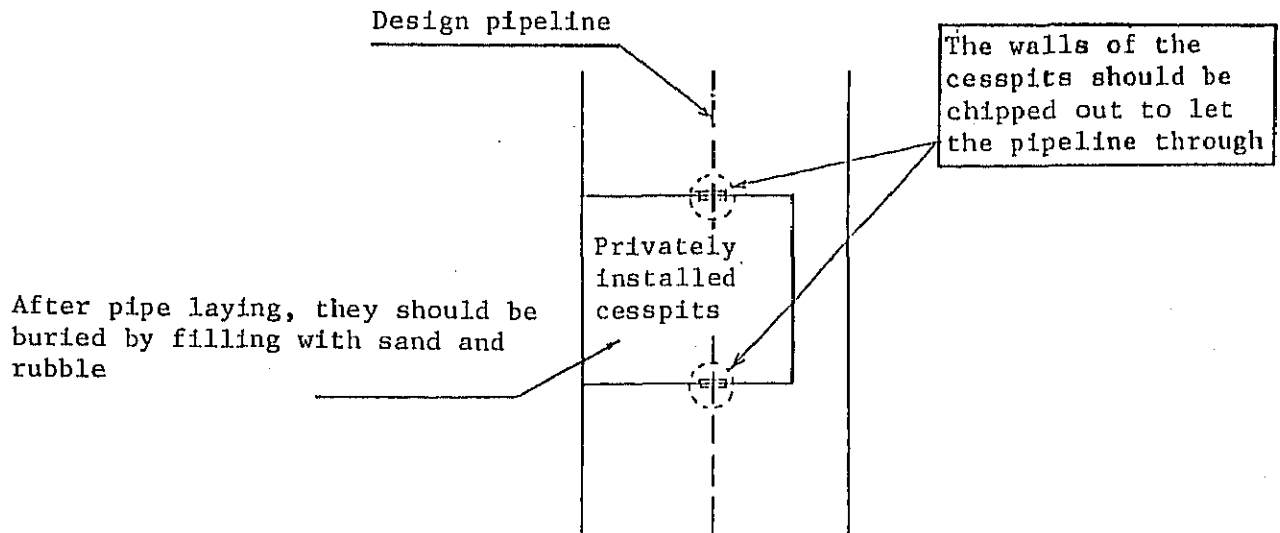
Typical Installation Method for Water Supply and Sewer Pipeline
